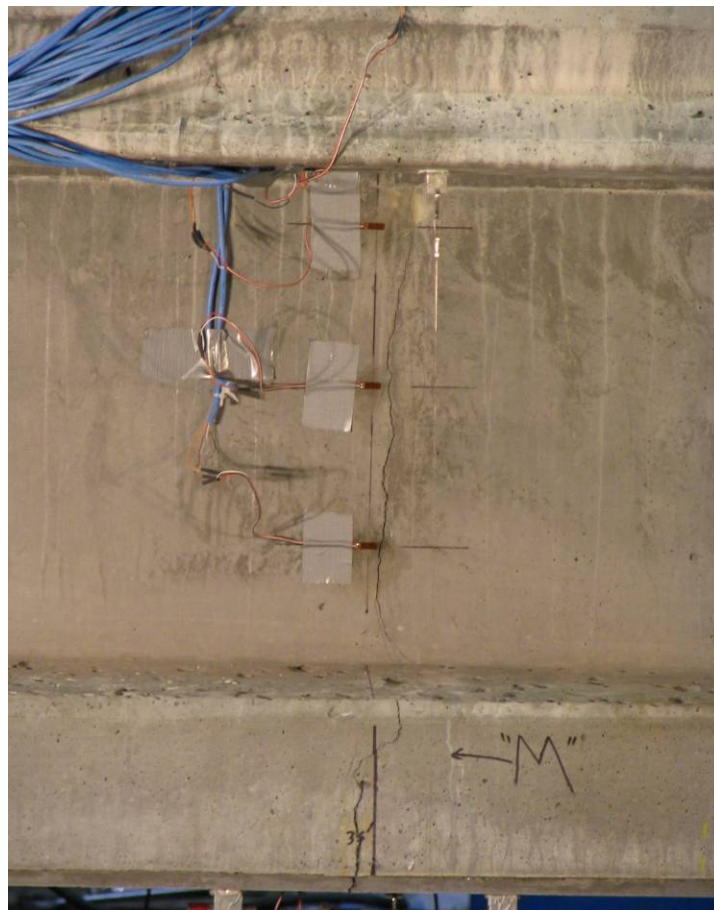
Photo. Crack on south face of Girder P4-45F just before failure.
